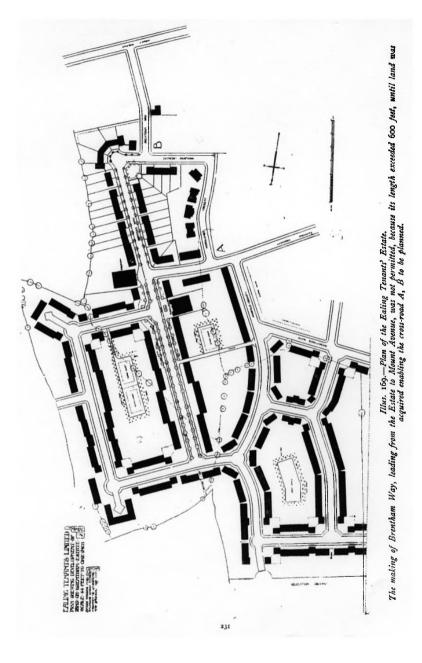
Block Plan of Brentham Way, Ealing, Barry Parker and Raymond Unwin, c.1906–7, as published in Raymond Unwin's Tourn Planning in Practice in 1909. The bold rectangular street block could be taken for a test-prototype for Nothing Gained by Overcrouding.
